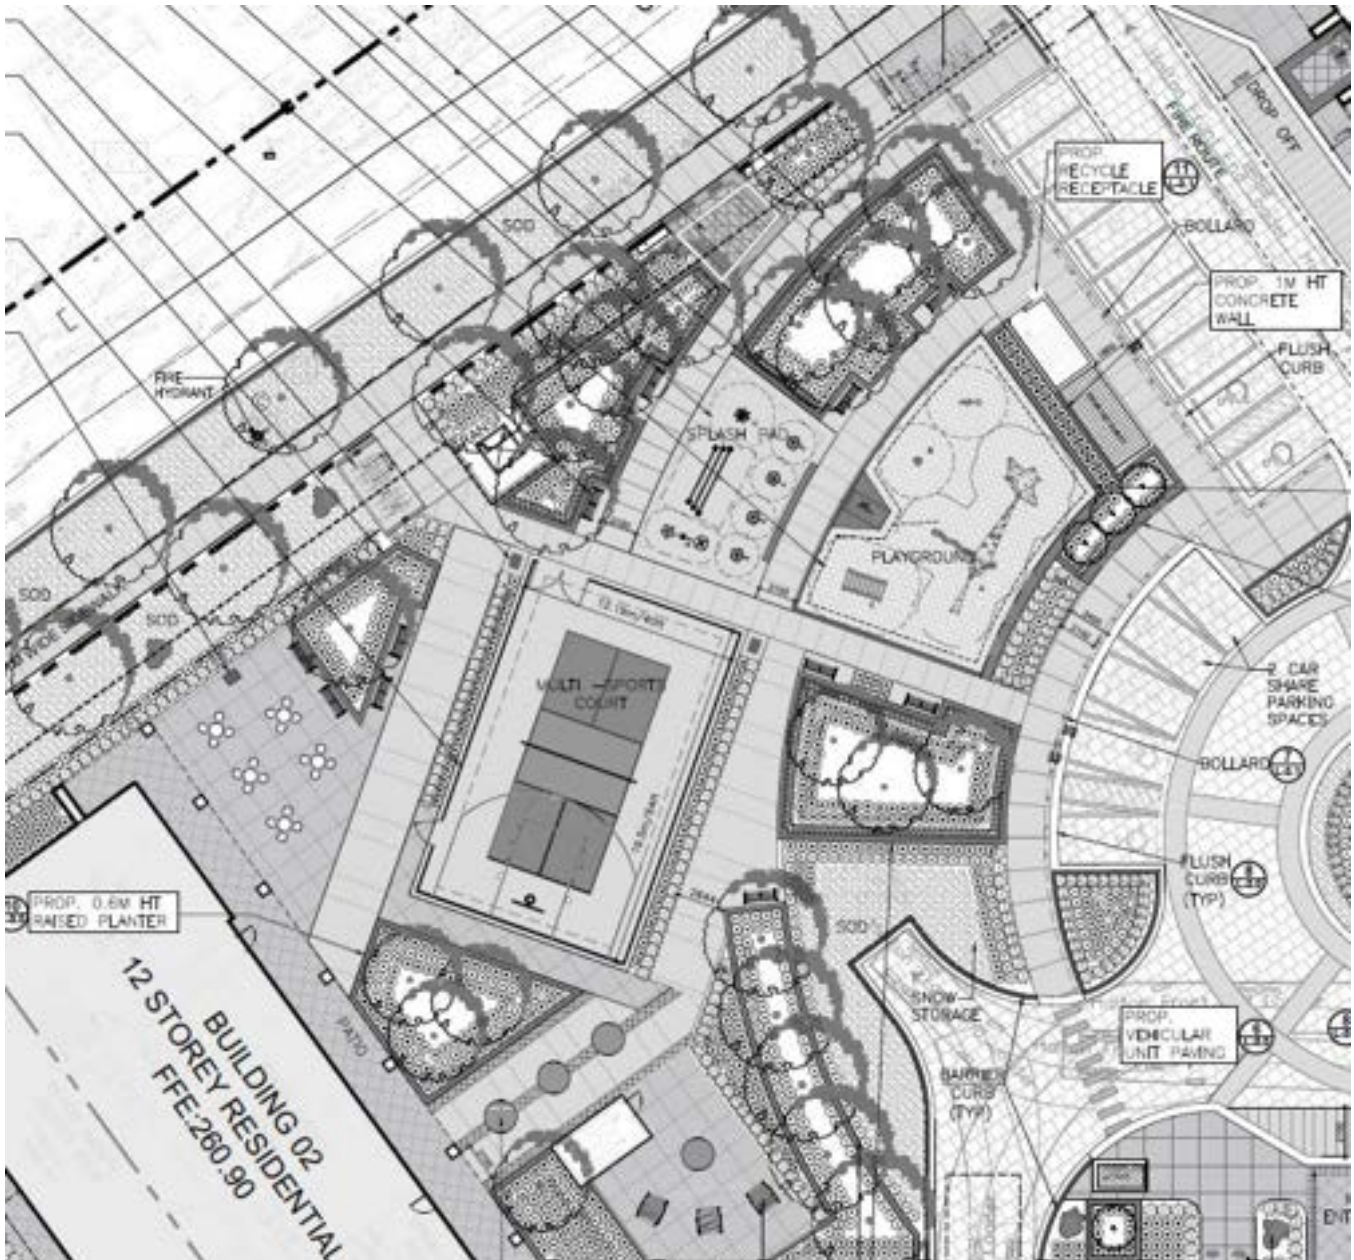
Proposed Landscape Plan of POP Space, prepared by MEP Design Landscape Architects
